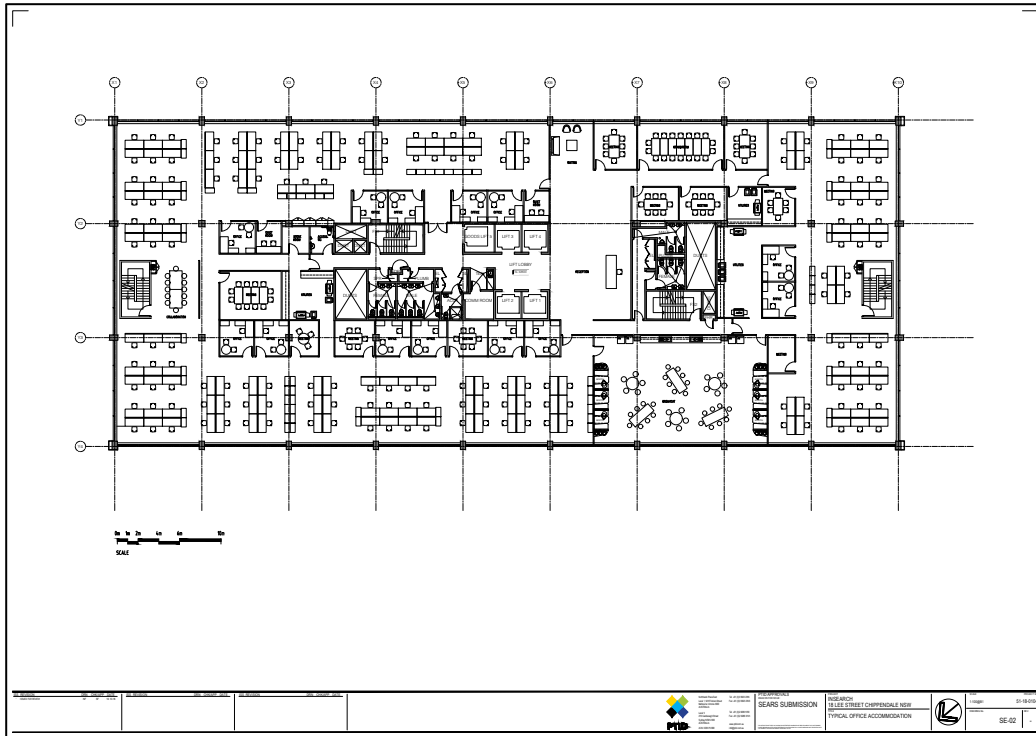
Proposed Fitout as Tertiary Institution – Typical Office Floors.
